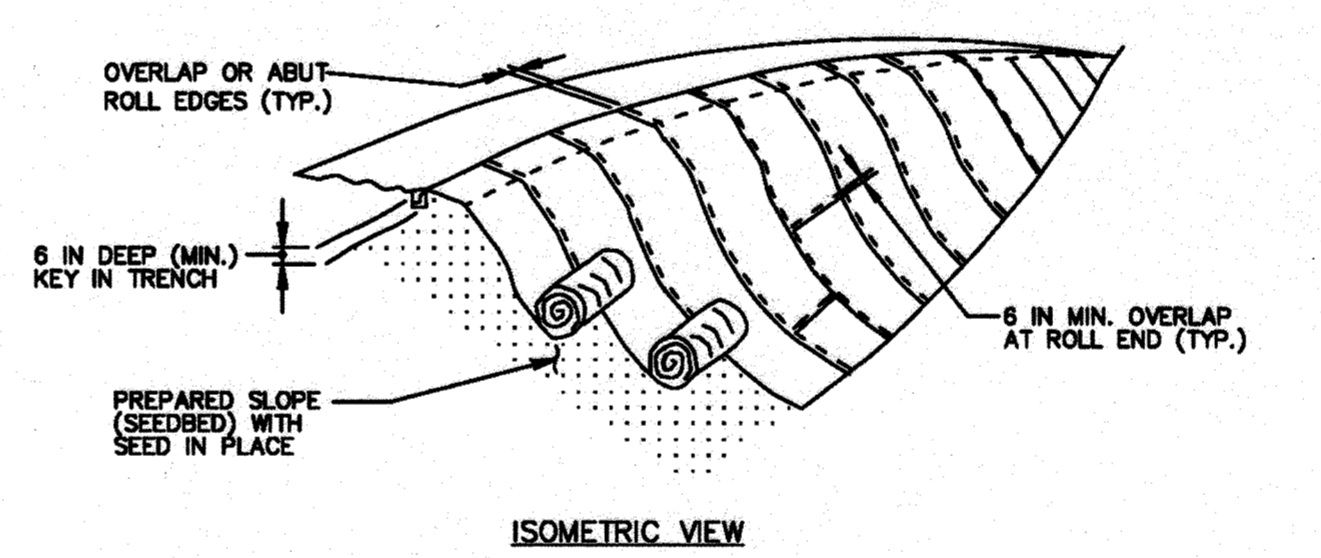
C PERMANENT SOIL STABILIZATION MATTING CHANNEL APPLICATION
